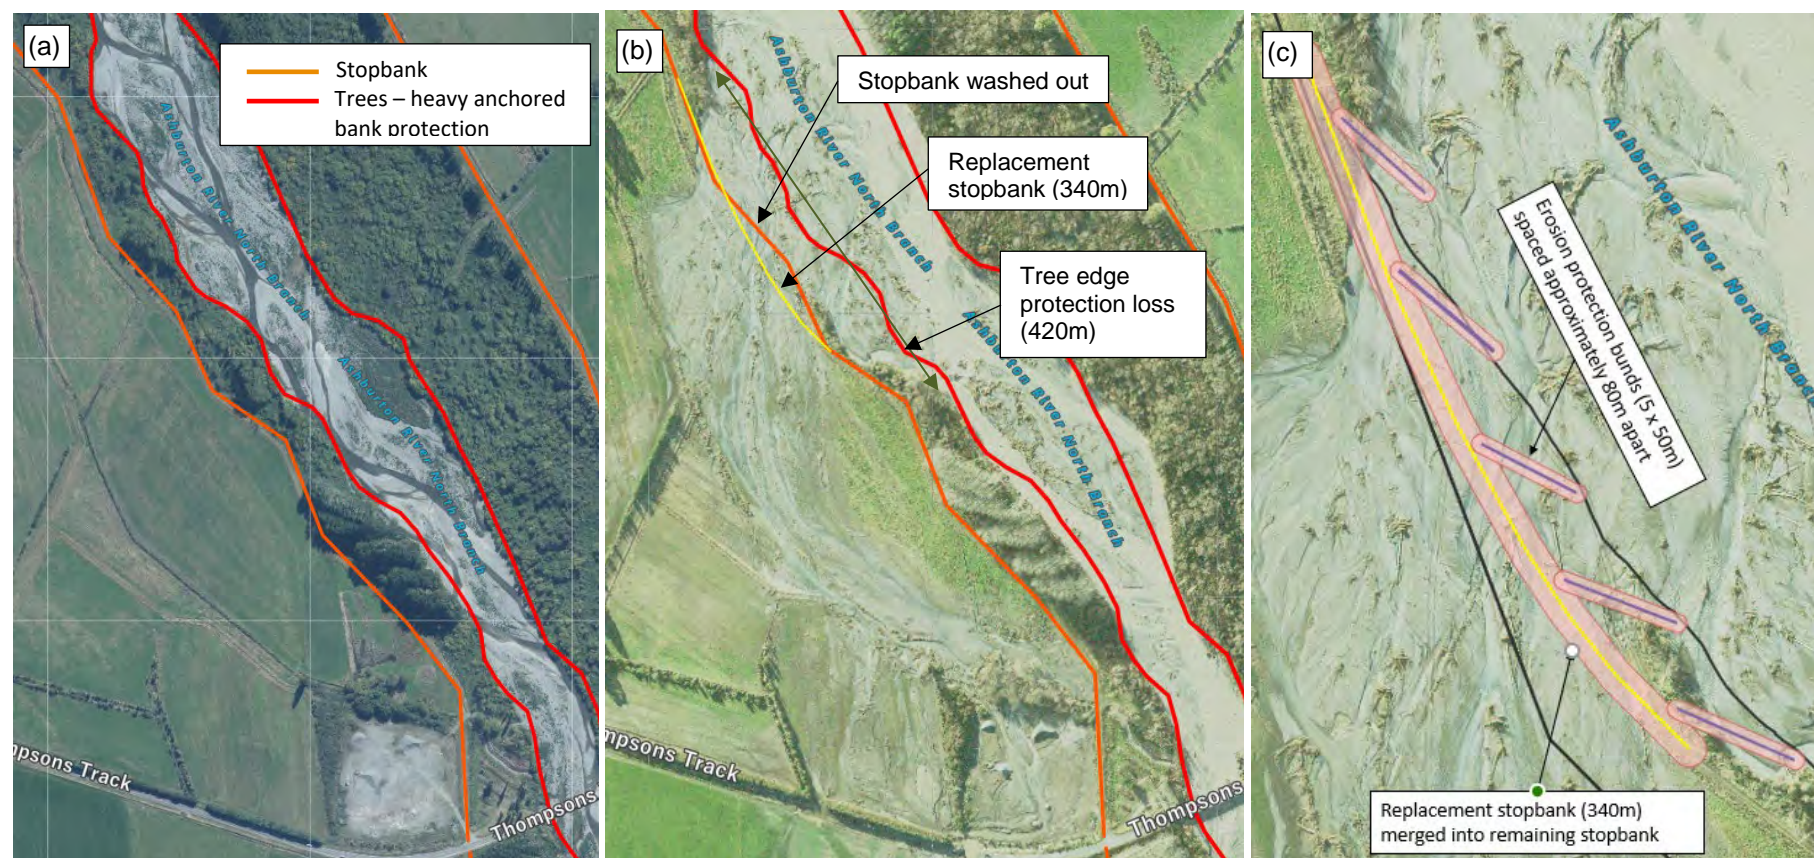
North Ashburton at Thompsons Track, approximately 23km northwest of Ashburton. (a) Aerial view prior to flood, (b) post-flood aerial showing extend of stopbank and tree edge protection asset loss, (c) Replacement stopbank and erosion protection bunds.
